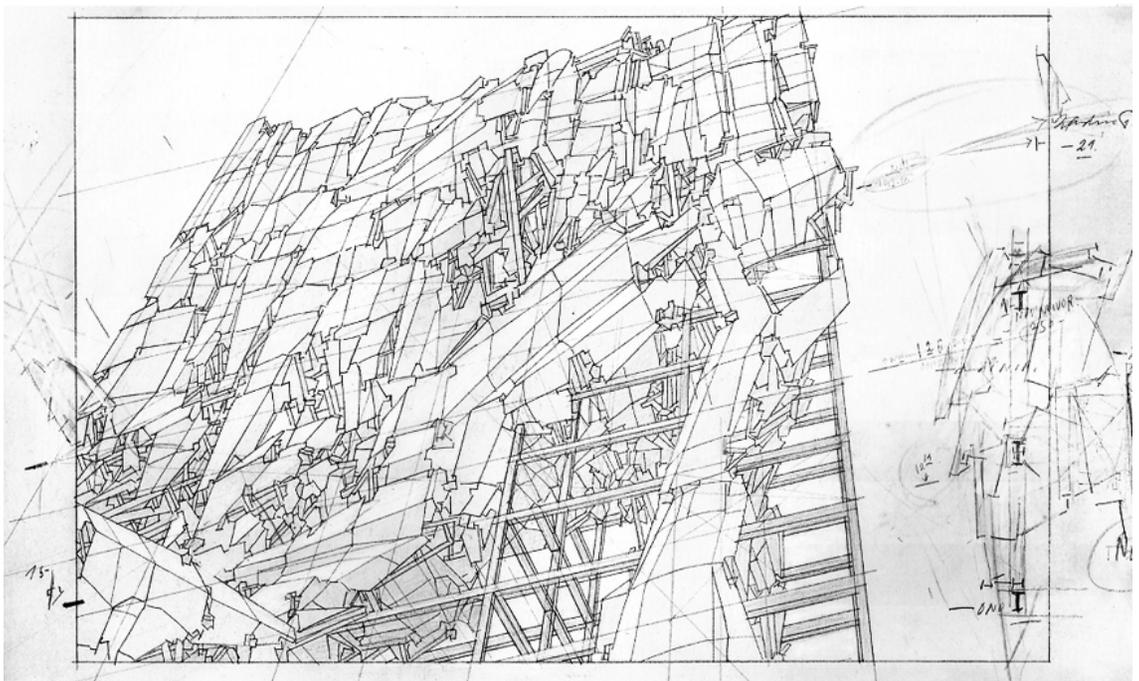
One of Woods' sketches of a possible new Parliament building of Bosnia and Herzegovina, integrating scavenged construction materials.<sup>17</sup>
